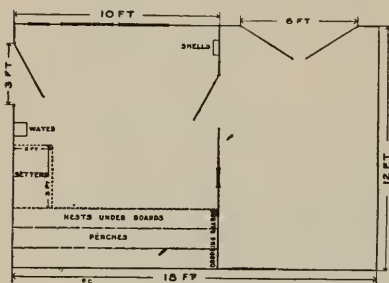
PLAN OF HOUSE FOR SINGLE FLOCK.
